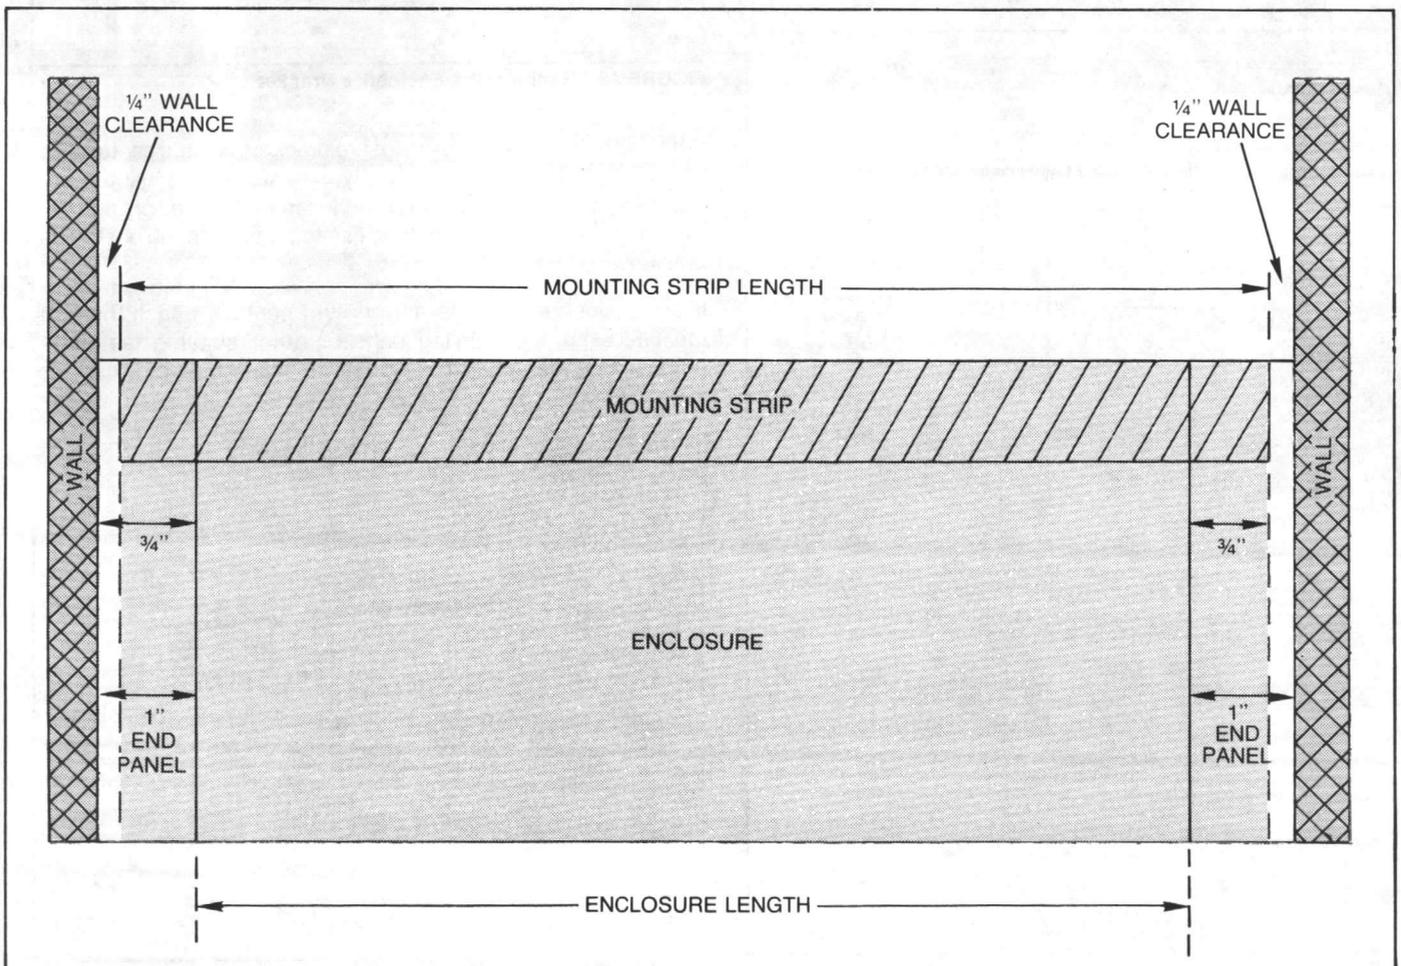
Wall-to-Wall Installation with End Panels (Front View)
